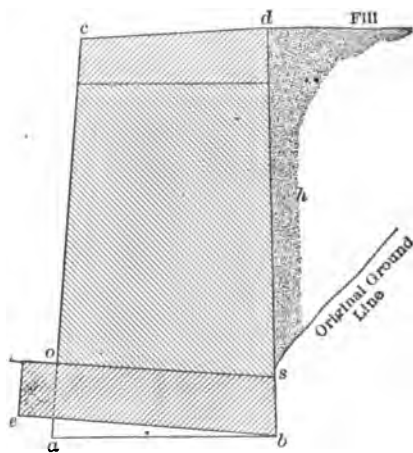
RETAINING WALL, TRAUTWINE TYPE.
